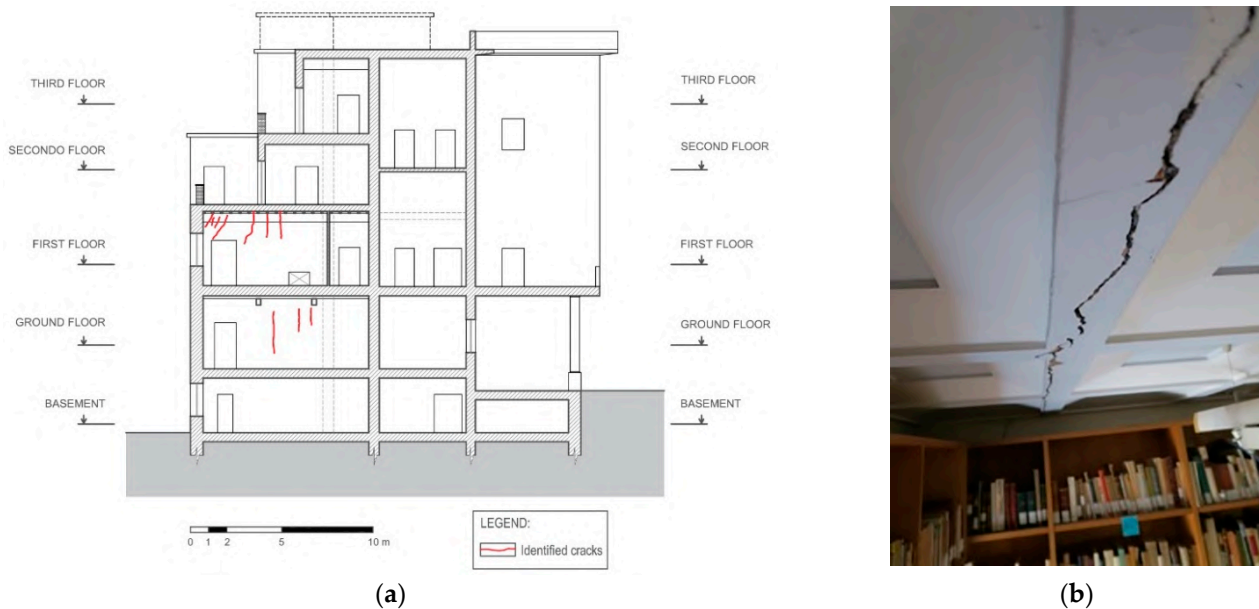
(a) Cross section of Palazzo Primoli and crack pattern; (b) crack on the first-floor ceiling.
